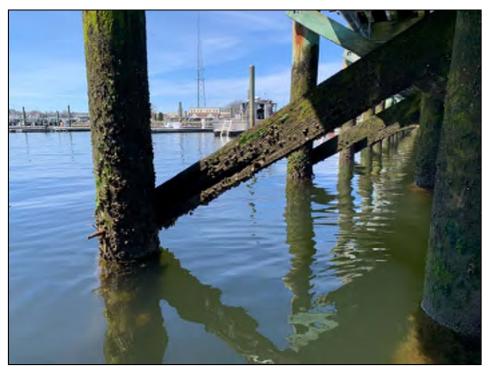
Deteriorated cross bracing hardware typical along pile supported pier.
